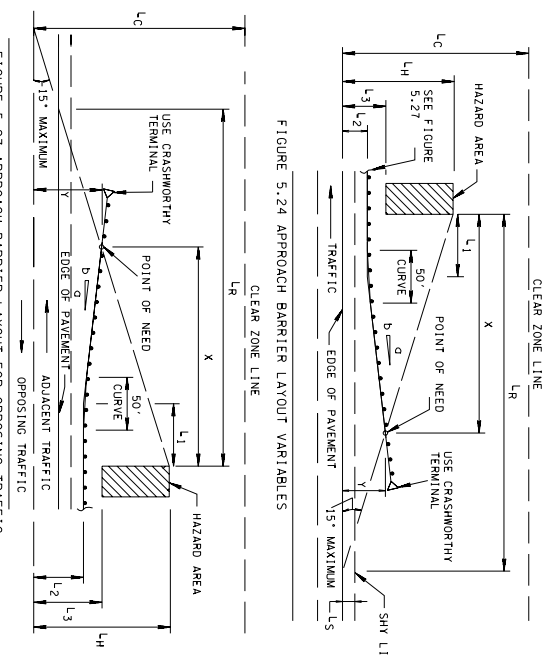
APPROACH BARRIER LAYOUT FOR OPPOSING TRAFFIC
